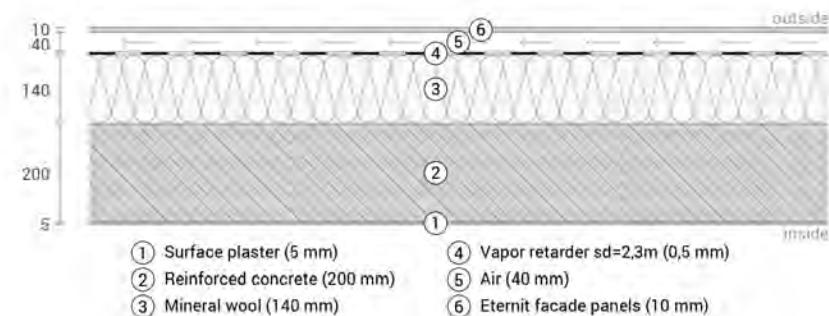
Detail of the exterior concrete wall with façade panels, by the author
